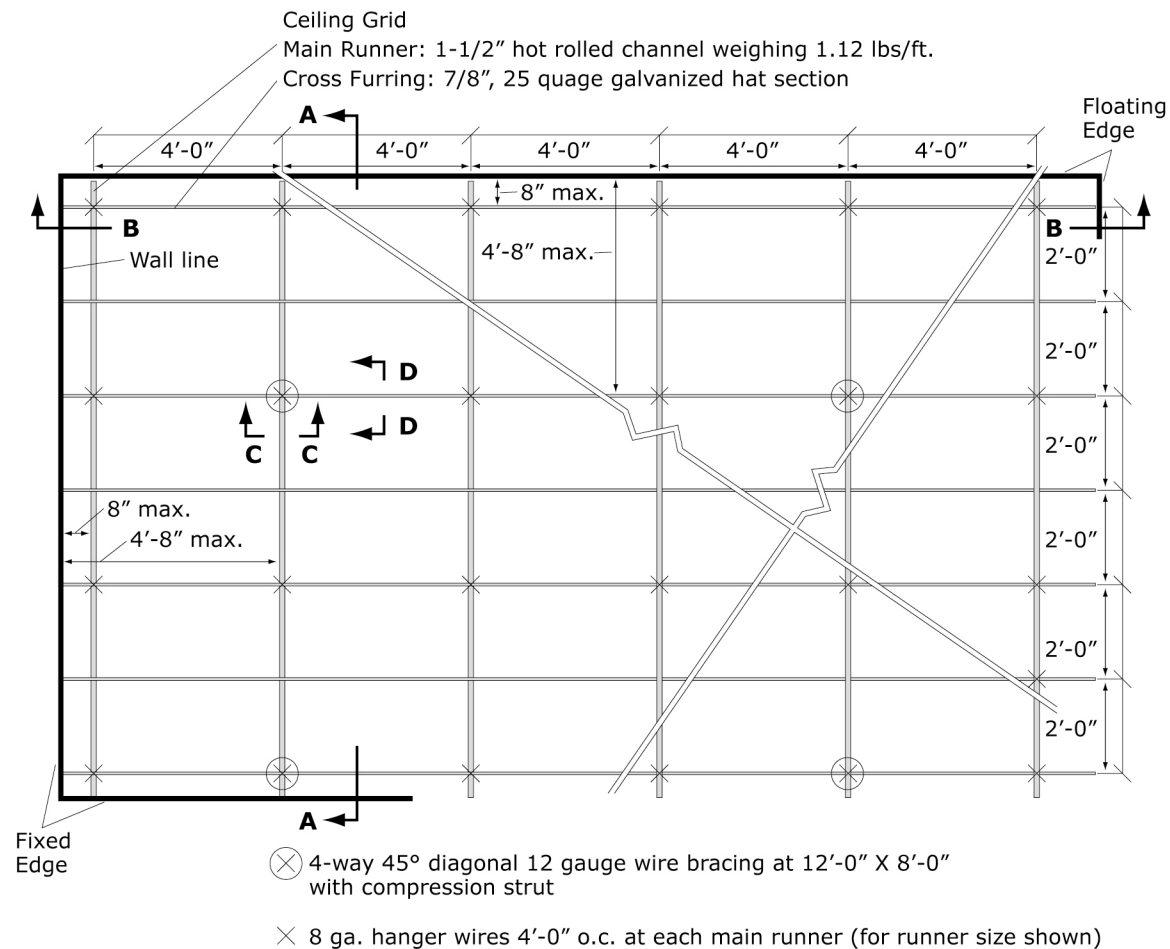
Diagrammatic view of suspended heavy ceiling grid and lateral bracing (PR).
